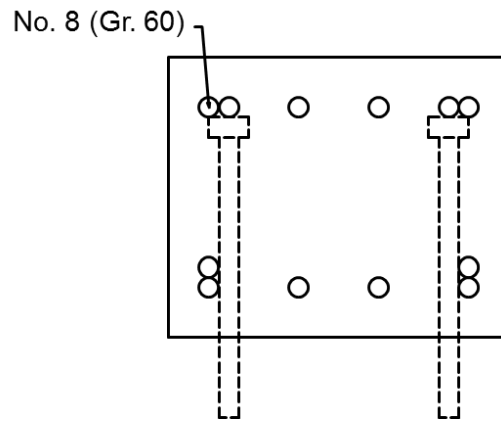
Layout B16: 12 No. 8 (Gr. 60)
